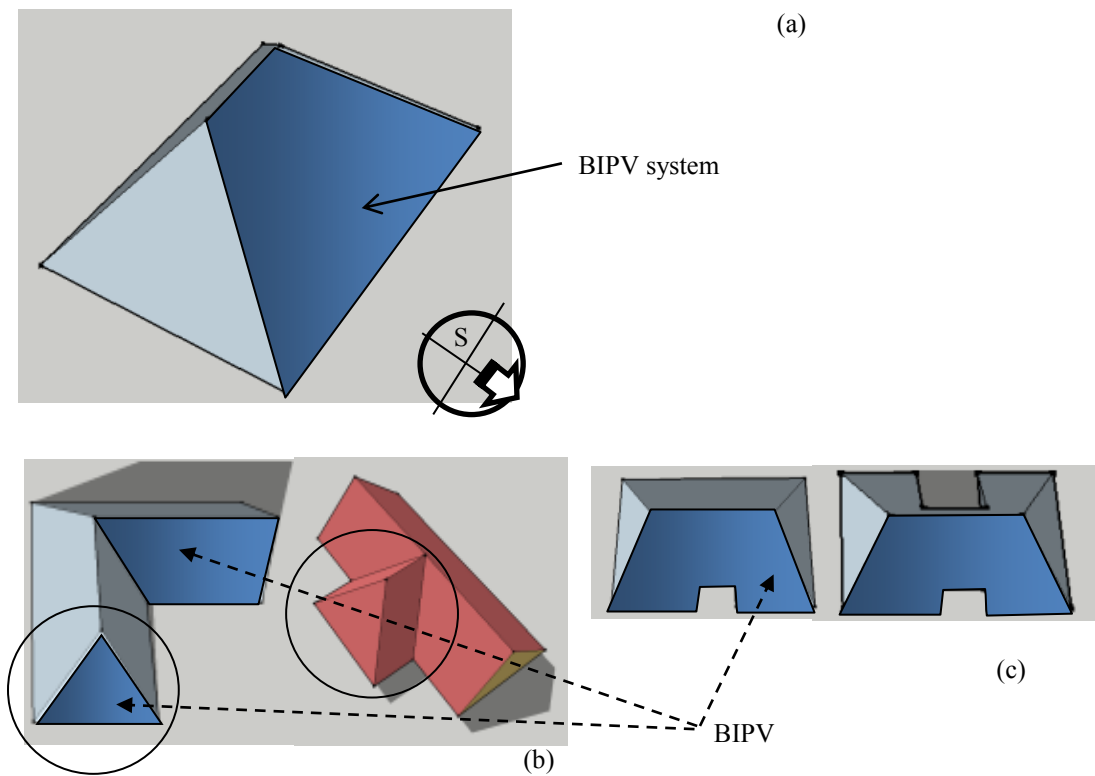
, Roof layouts of basic designs: a) Single ridge design for convex shapes; b) Double ridge designs in L, T; c) Roofs of U and H shapes.
